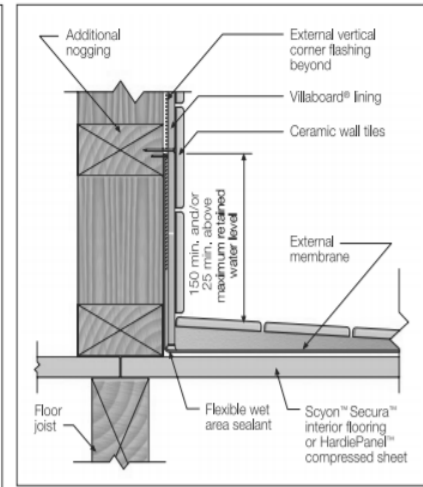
EXTERNAL MEMBRANE - VILLABOARD LINING
